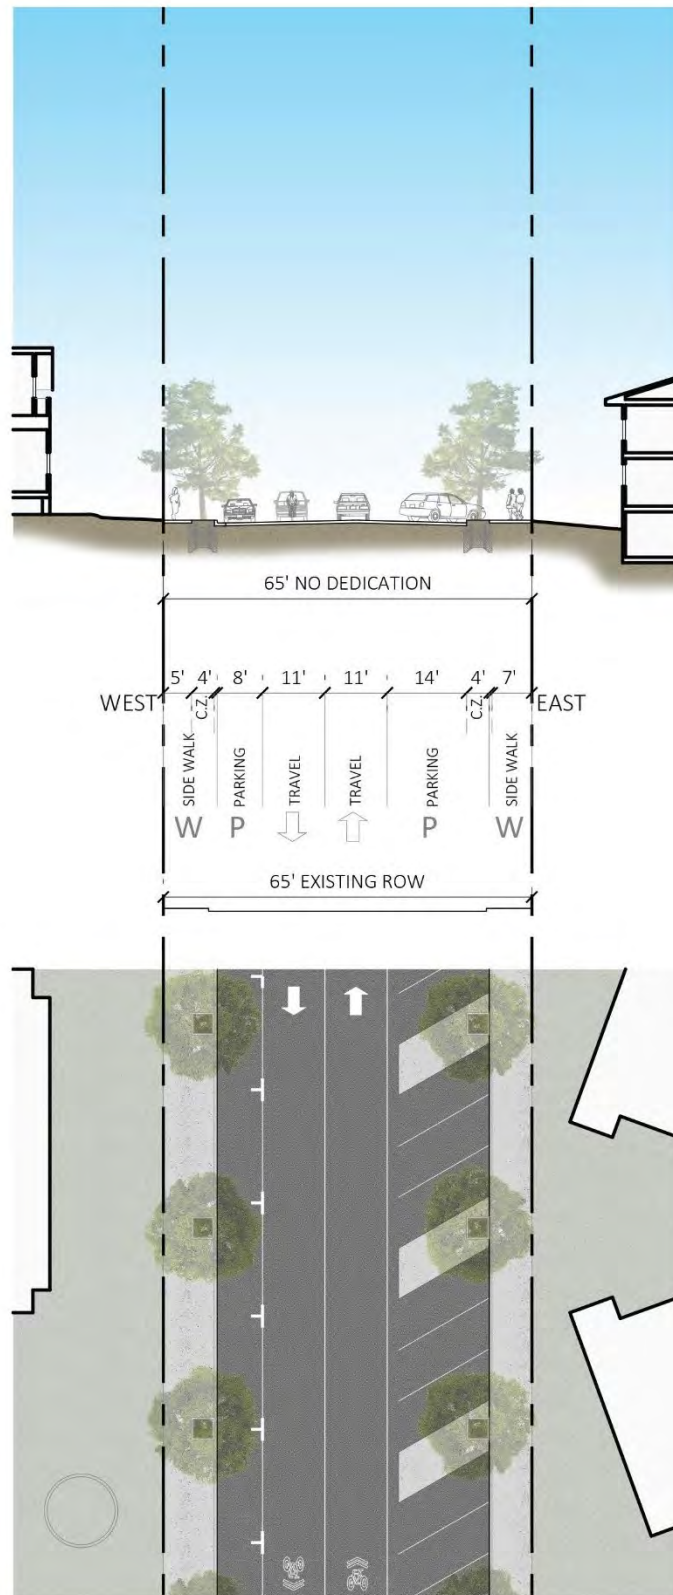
Cliff Street Between First Street and Beach Street (12)
